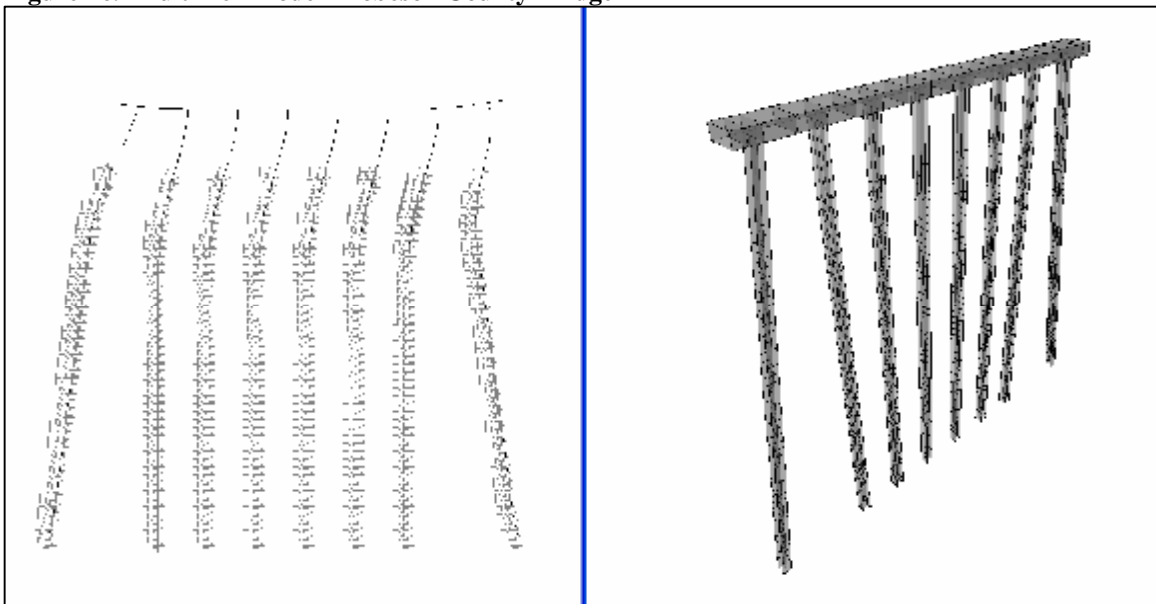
SAP Model--Robeson County Bridge, Deformed and Unloaded Shapes
